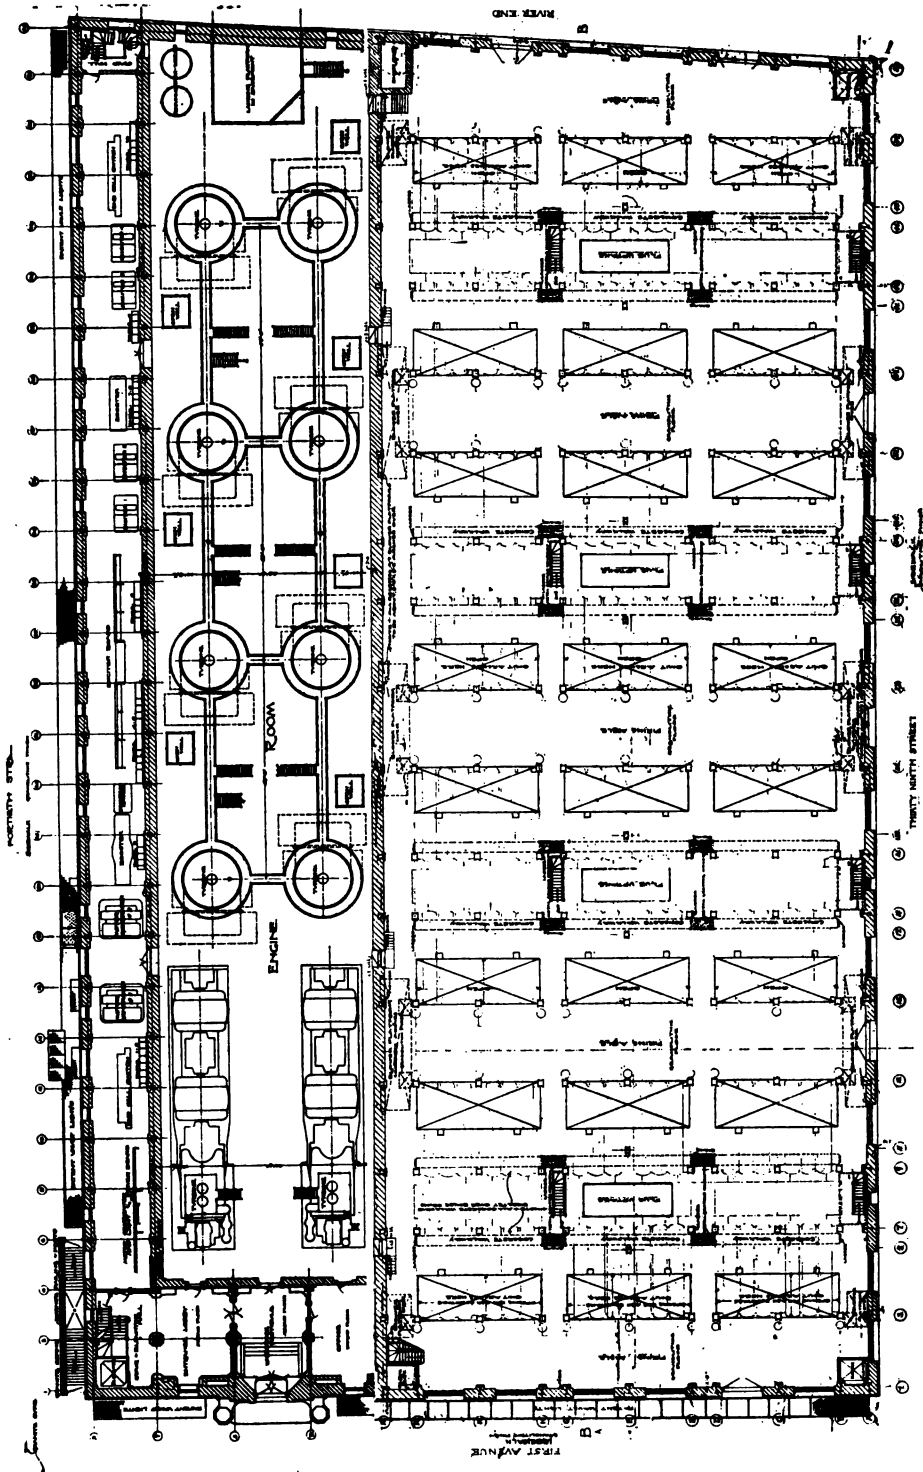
Part Plan of First Floor, Waterside No. 2.
